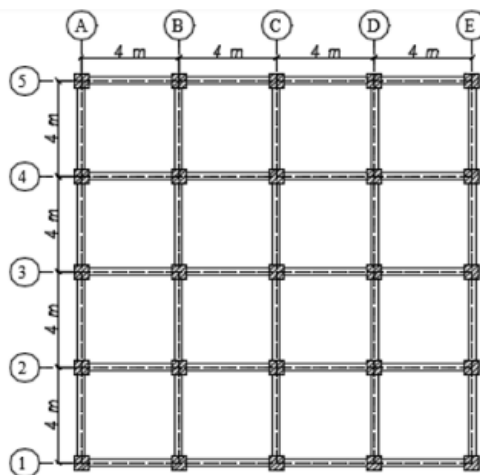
Plans of Models A, B, C (for floors from 1 to 7) and D (for floors from 1 to 7)
